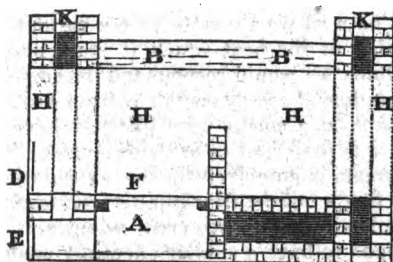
Longitudinal section of the salt pan, as heated by a furnace.
